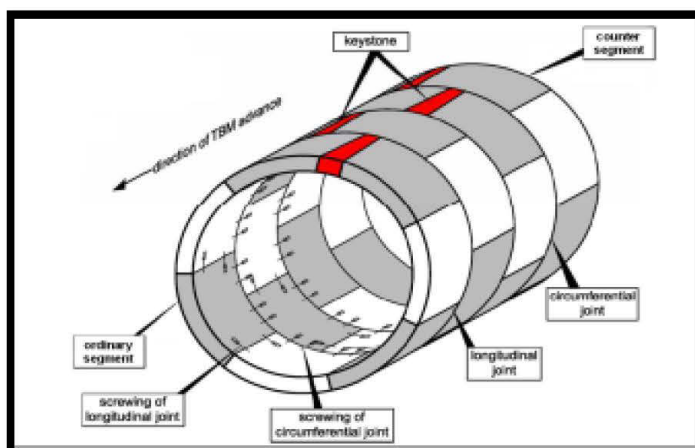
Typical final precast concrete segmental tunnel liner
